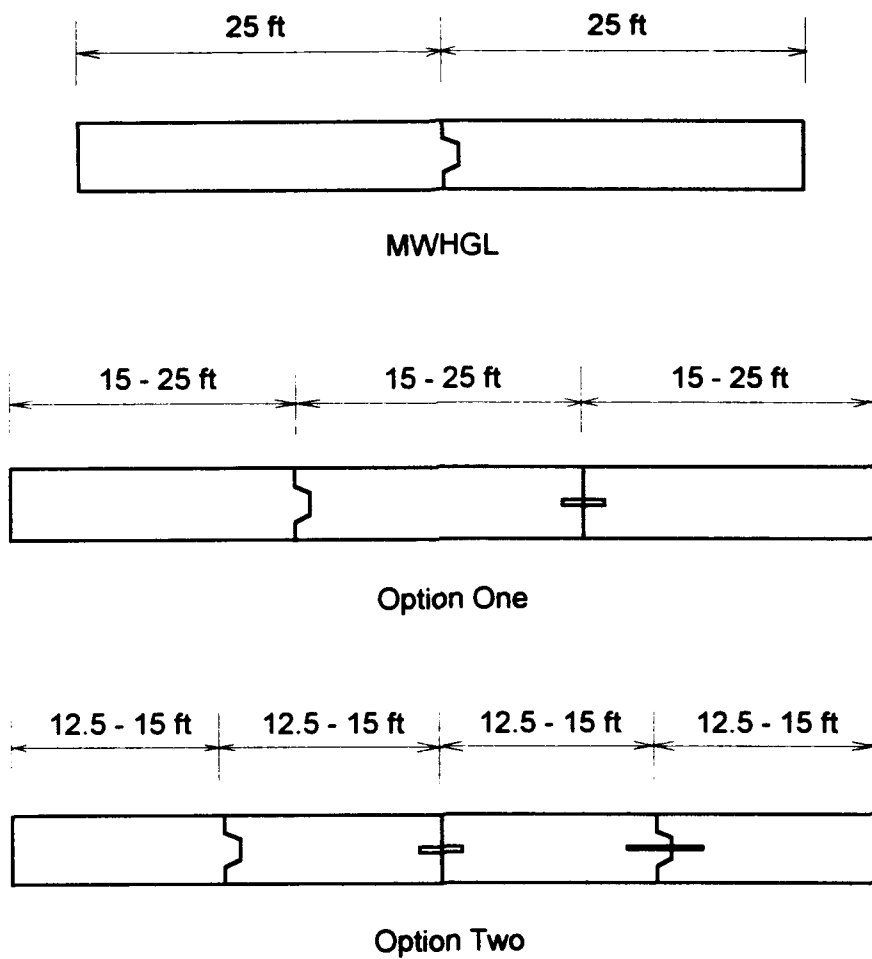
PCC CONSTRUCTION CONSIDERATIONS
